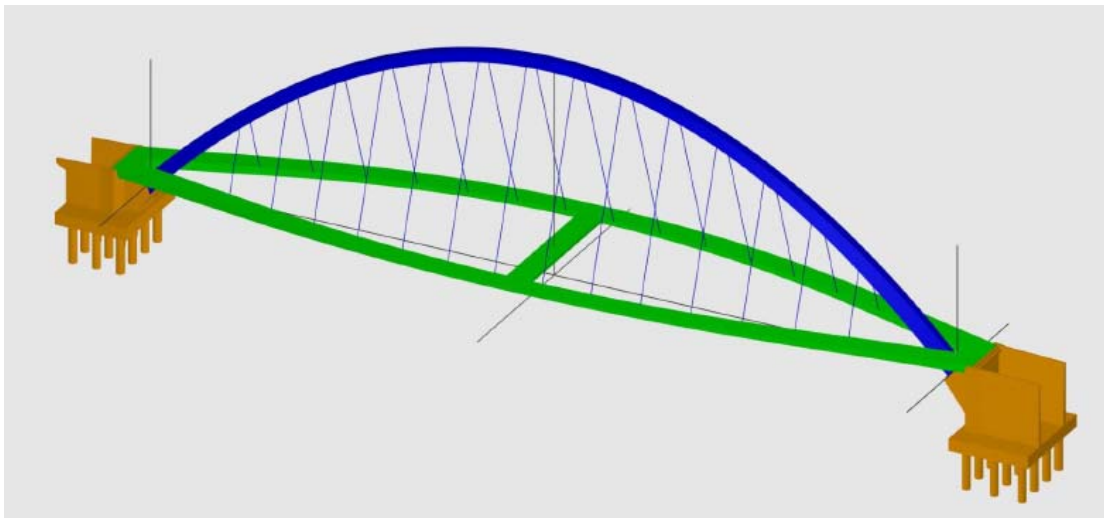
Steel structure of Center Street Pedestrian Bridge.
